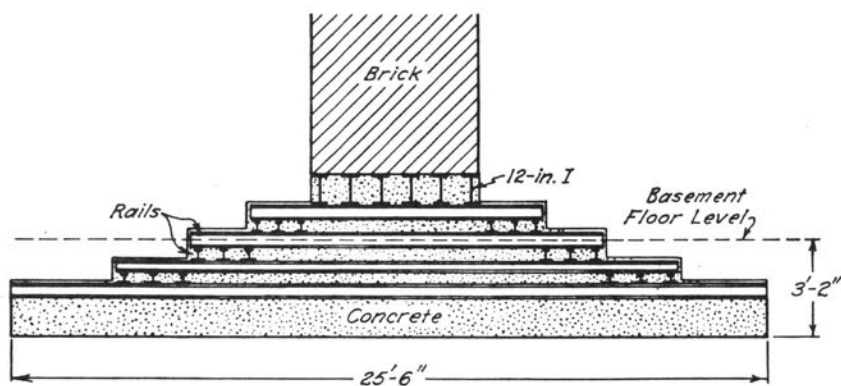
SECTION THROUGH RAIL-GRILLAGE FOOTING OF MONADNOCK BLOCK
